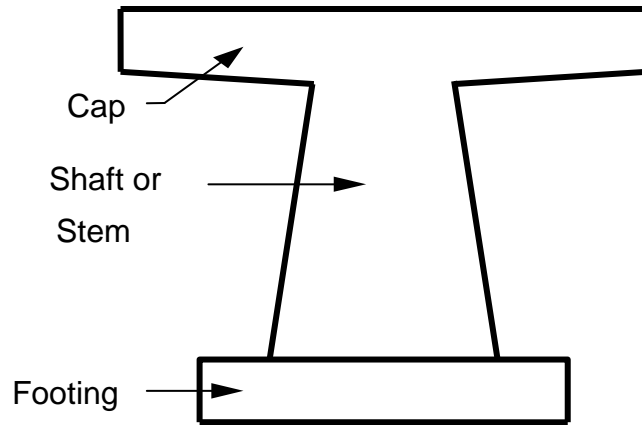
Single Stem Pier (Cantilever or Hammerhead)
